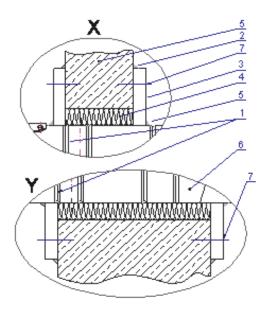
Imbedding the round fire damper into the wall and fastening in place with Rockwool and finishing with cover plates
